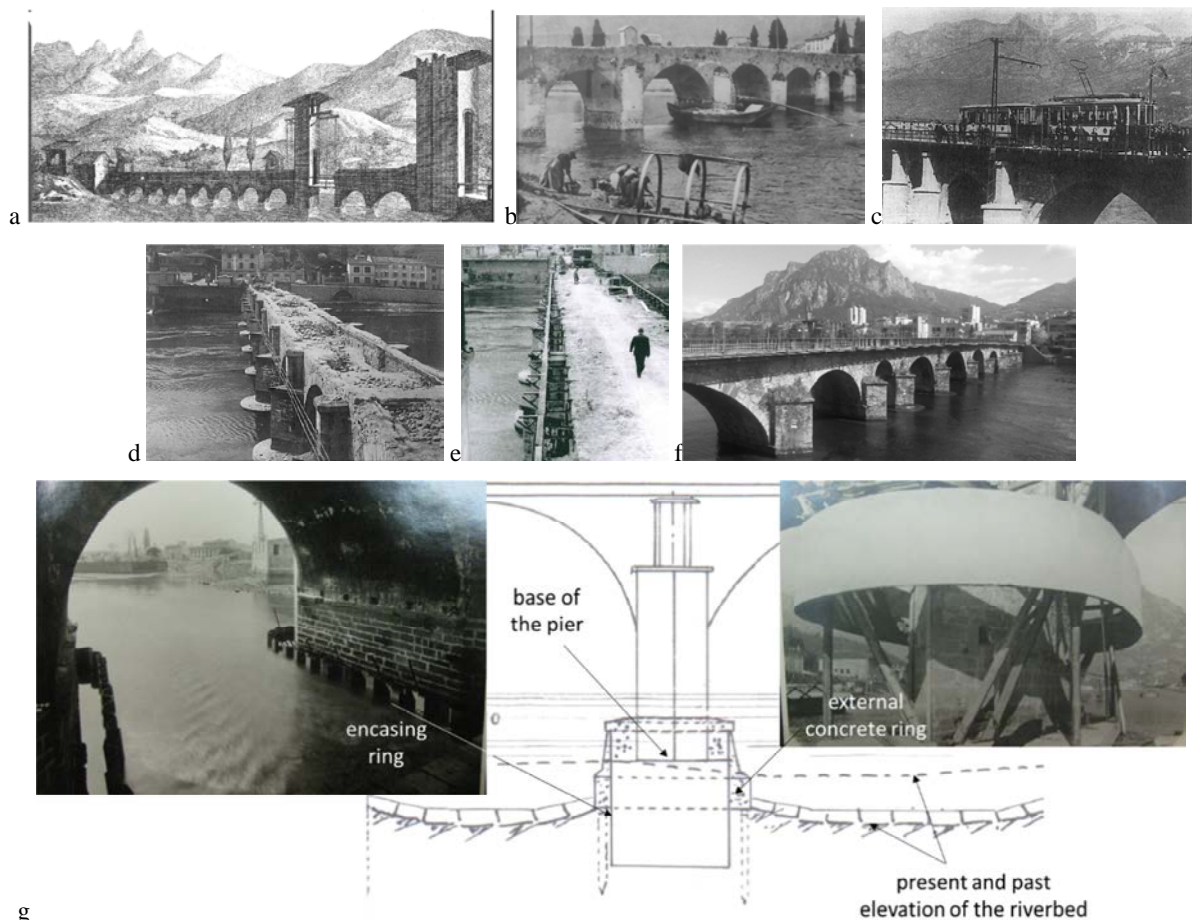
(a) Plot of the bridge in the XVI century; (b) view of the bridge in 1900; (c) tramway transit in 1910; (d) view of the works in 1960; (e) detail of the concrete caisson and of the external footbridges; (f) view of the bridge in 2014; (g) placement of the steel encasing ring and of the reinforcing concrete ring in 1960. Courtesy of Lecco Municipality and of Consorzio Fiume Adda.
